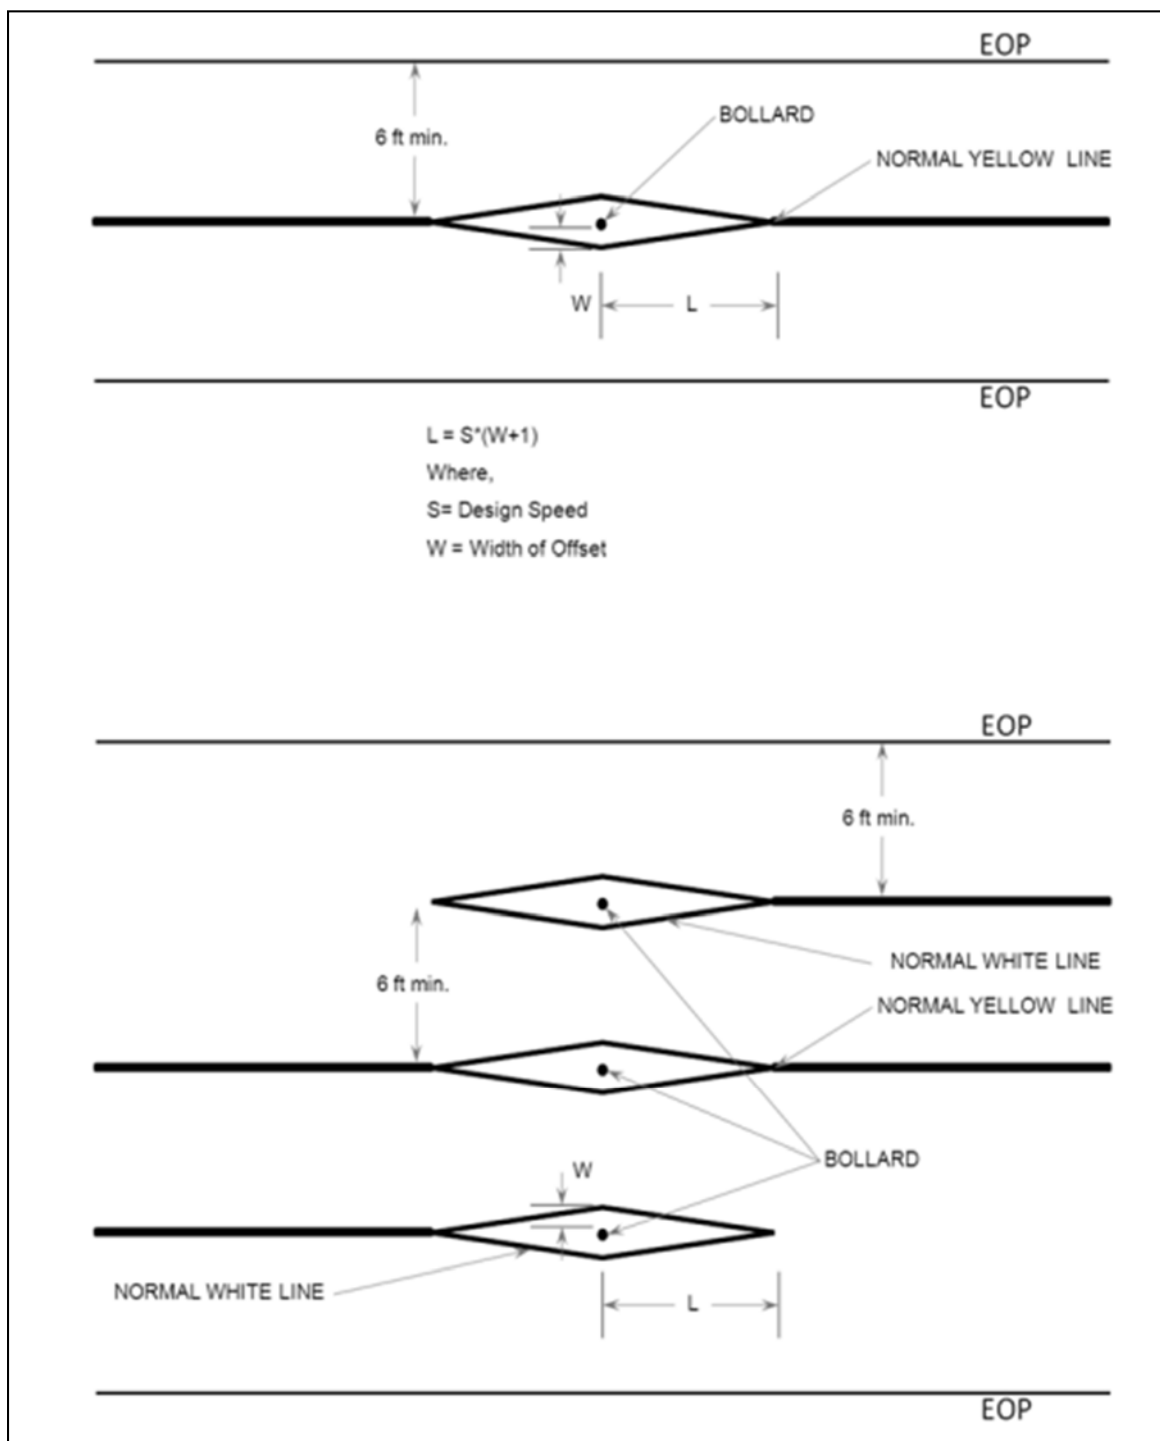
Obstruction Striping around Bollards on Shared Use Paths
